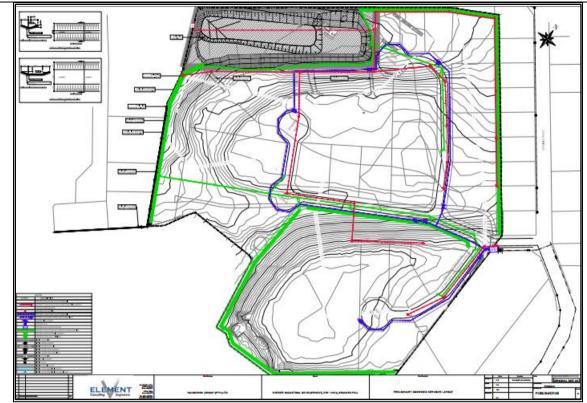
Proposed Services, Combined (Source: Element Consulting Engineers, 2020)
